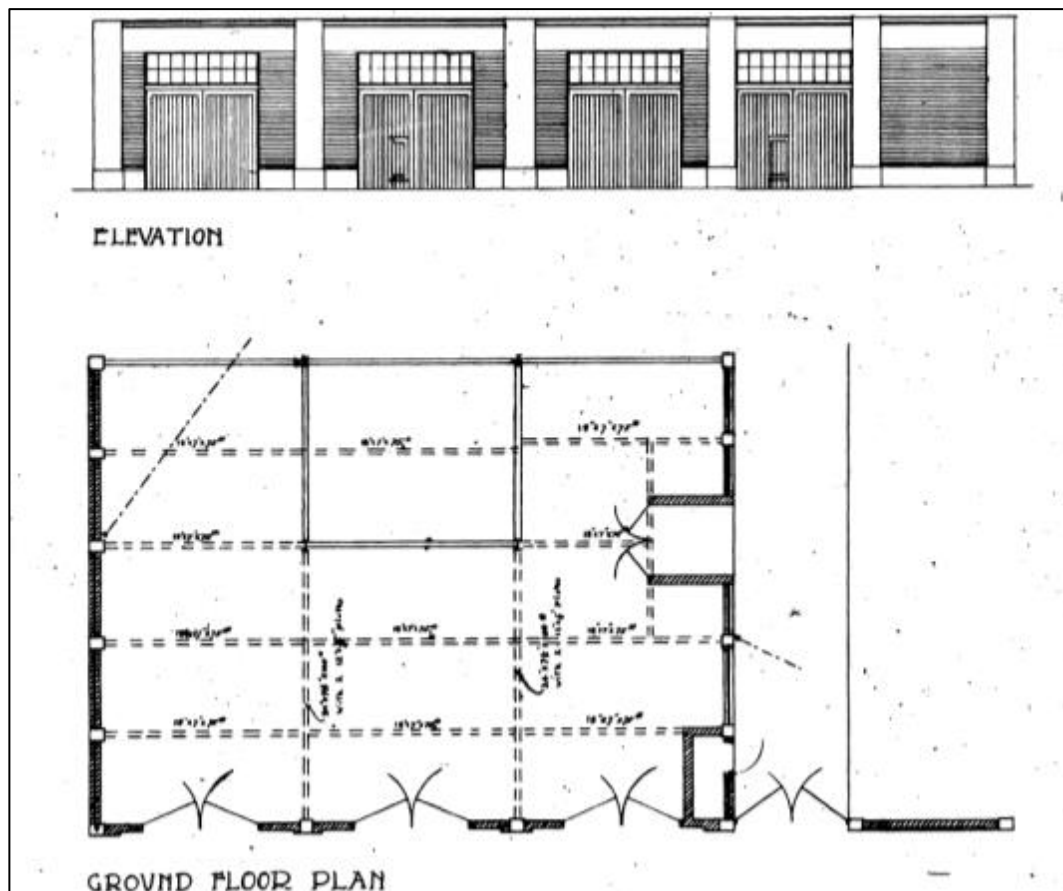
1922 plans showing the ground floor and Cumberland Street Façade of Building No. 12 (DCC Archives).
